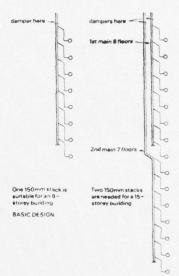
Use of multiple ventilation stacks in tailer buildings, the examples are based on table V and dwellings of type 1
